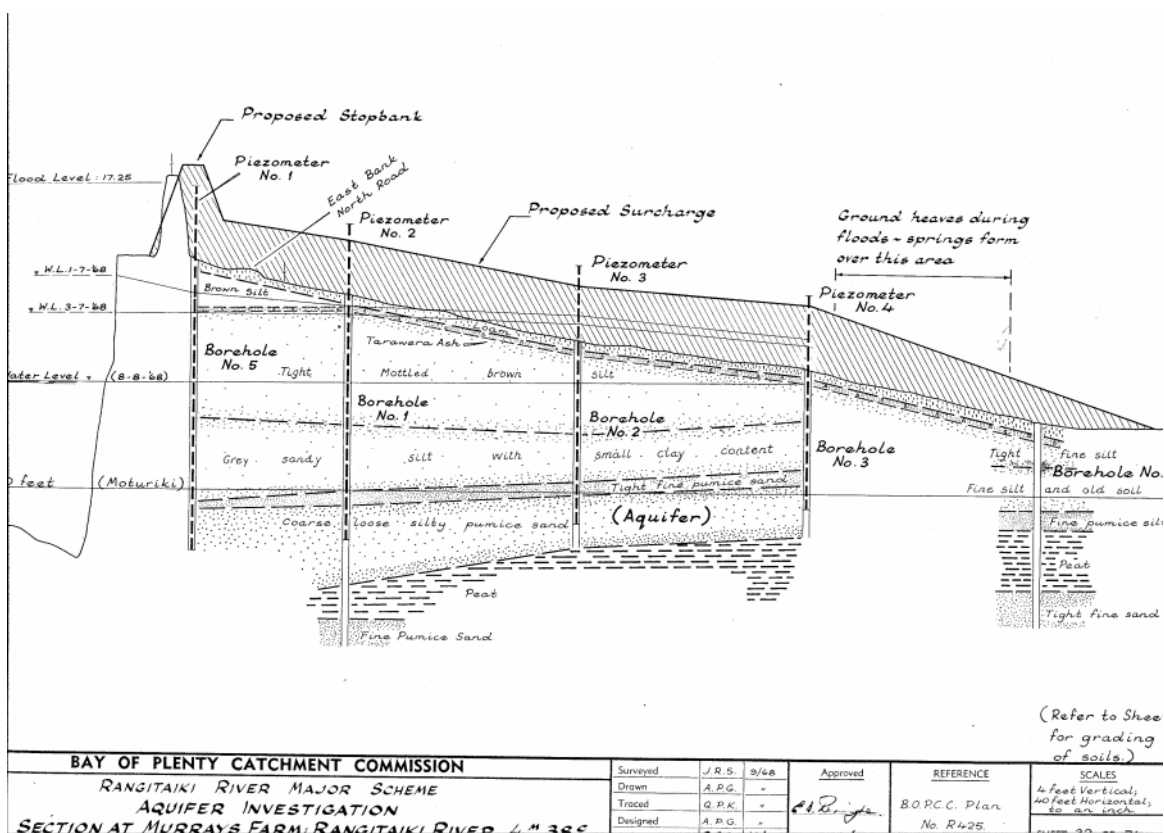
Typical river bank cross section (From Original Scheme Plans, 1968)
